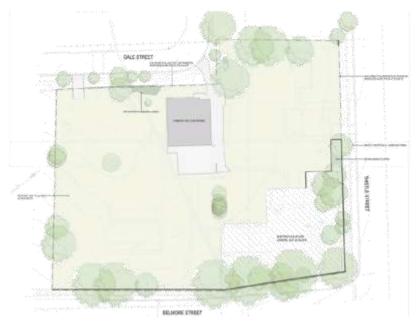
CONCEPT SITE PLAN Source: Pedavoli Architects
